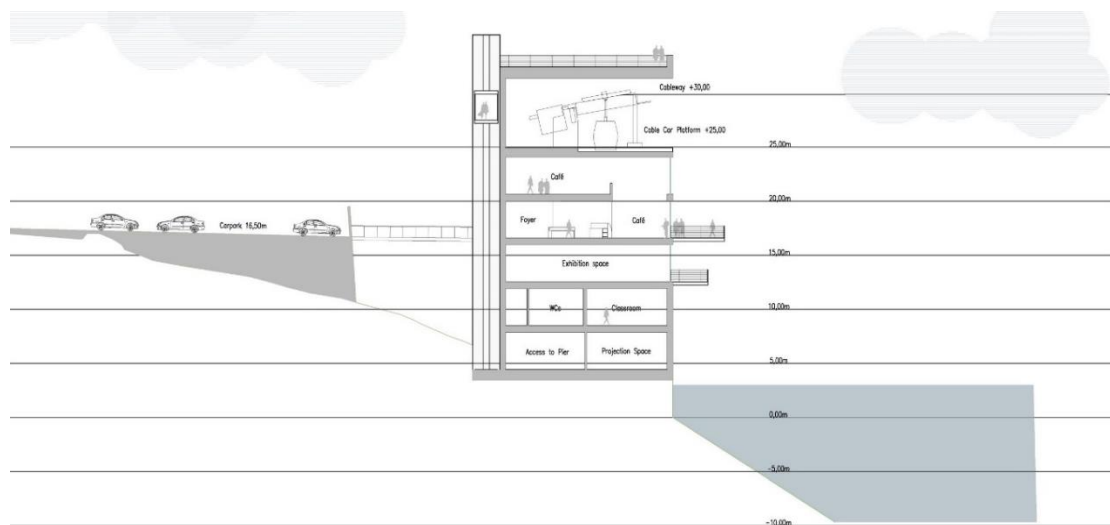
Option 2 architectural section showing how the tower addresses the sloping site topography
